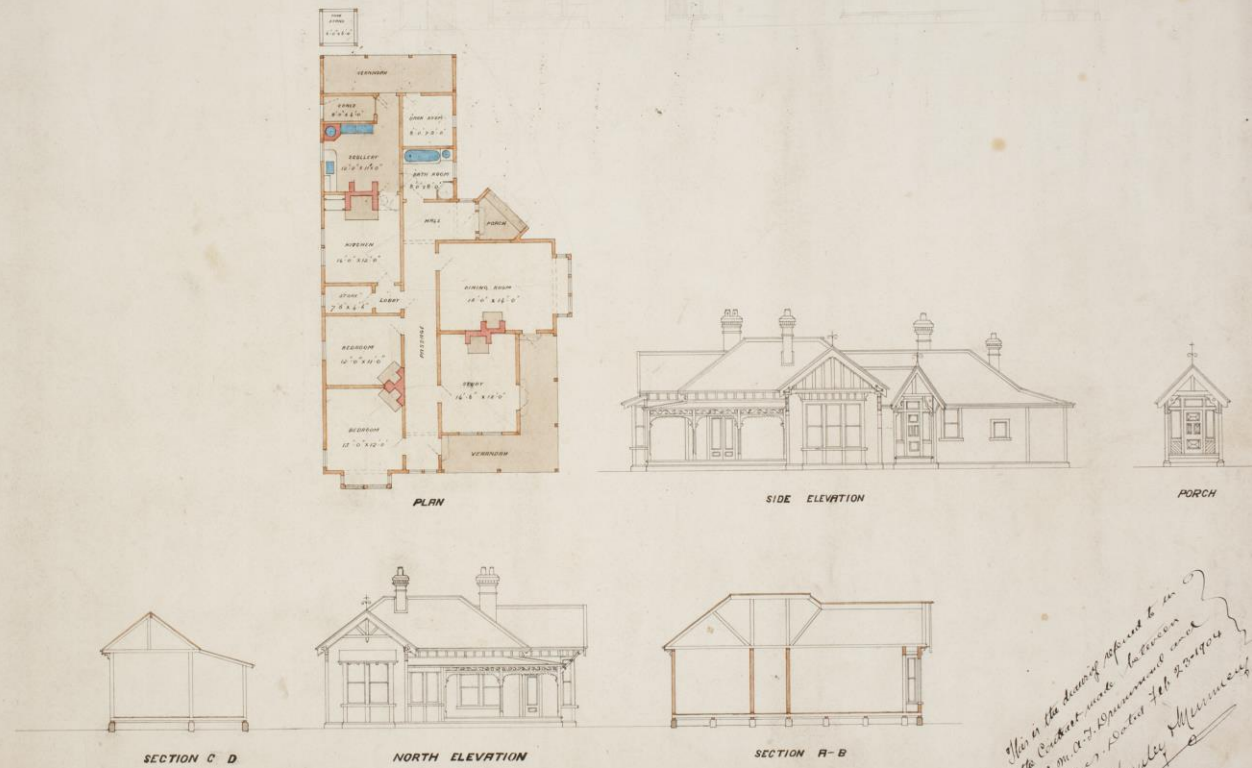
Collins and Harman, M. A. T. Drummond, House, Leinster Rd., plan, elevations and sections (1904).
